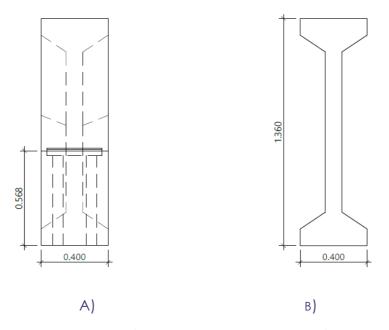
VARIABLE SECTION BEAM: A) SECTION AT THE SUPPORT; B) SECTION AT 1/2 SPAN HALF
